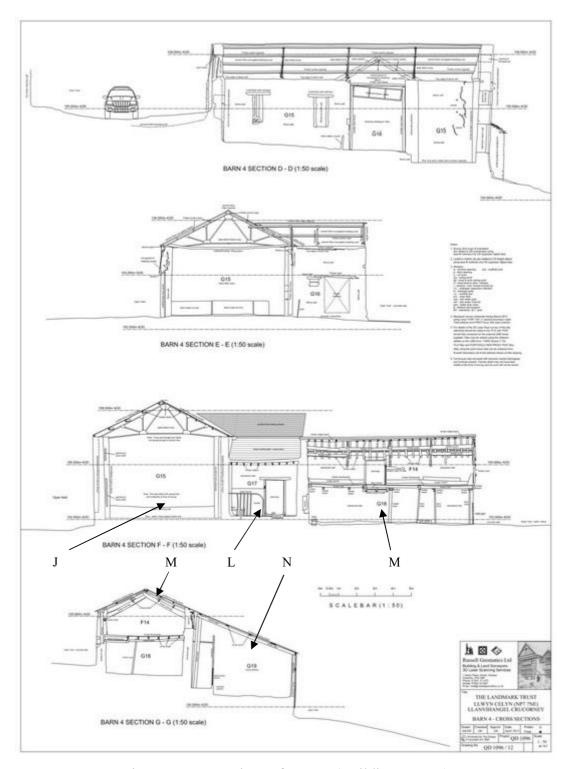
Cross-sections of Barn 4 (Buildings J to N).
